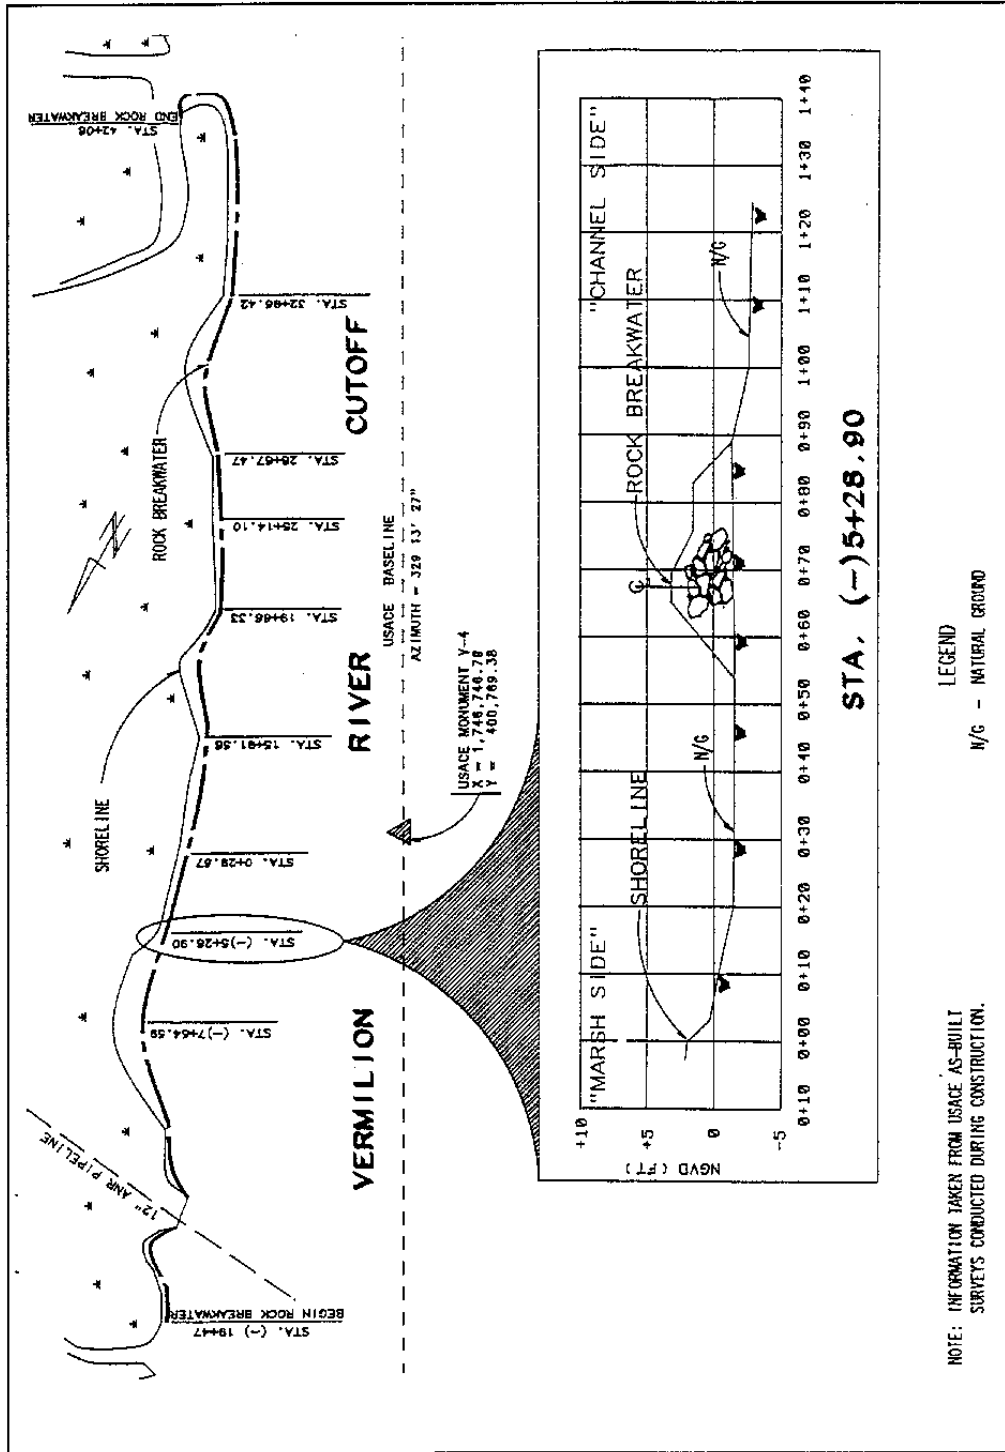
Plan and cross section showing location and elevation profile of station (-) 5+28.90 in as-built survey (data from USACE 1996).
